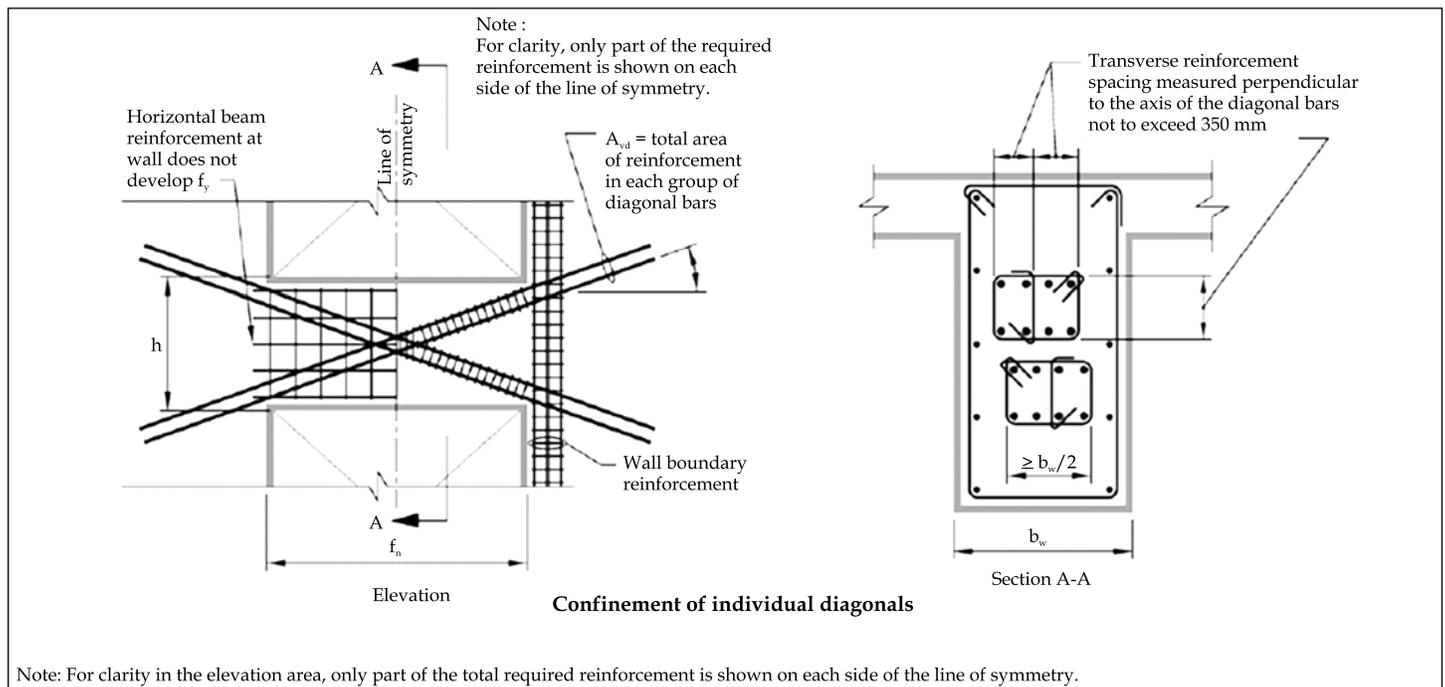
Coupling beams with diagonally oriented reinforcement. Wall boundary reinforcement shown on one side only for clarity (Source: ACI 318:2014)
